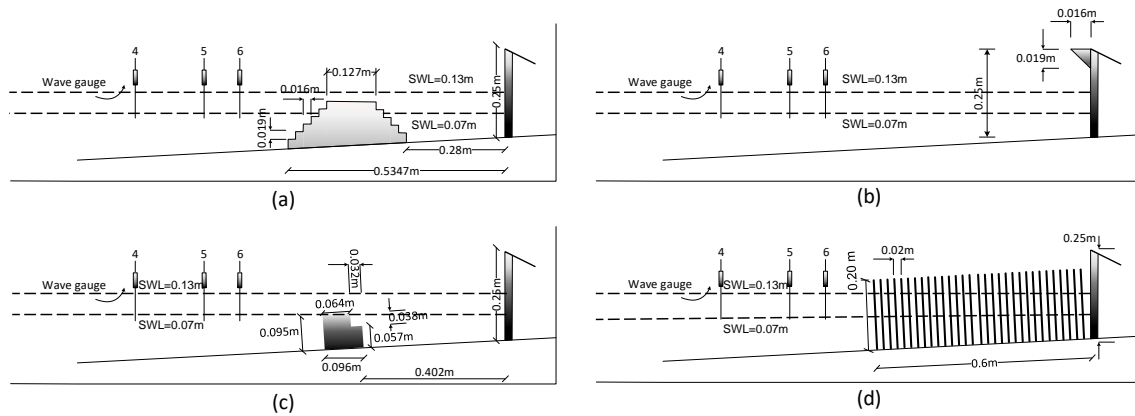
Experimental setup for retrofit solutions, (a) Cross-section of the reef breakwater (b) Cross-section of the recurve wall (c) Cross-section of the diffraction pillars [0.095m width, 0.07m between per pillar] (d) Cross-section of the vegetation
